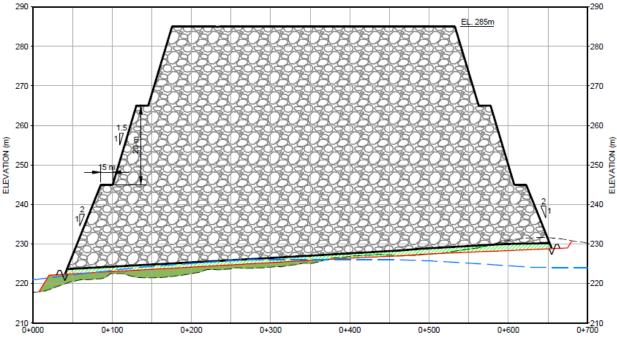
TYPICAL CROSS-SECTION OF THE WRFS
